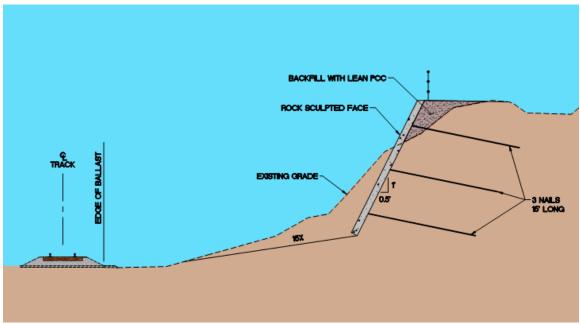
Drainage Area 5 - Soil Nail Reinforcement Alternative
